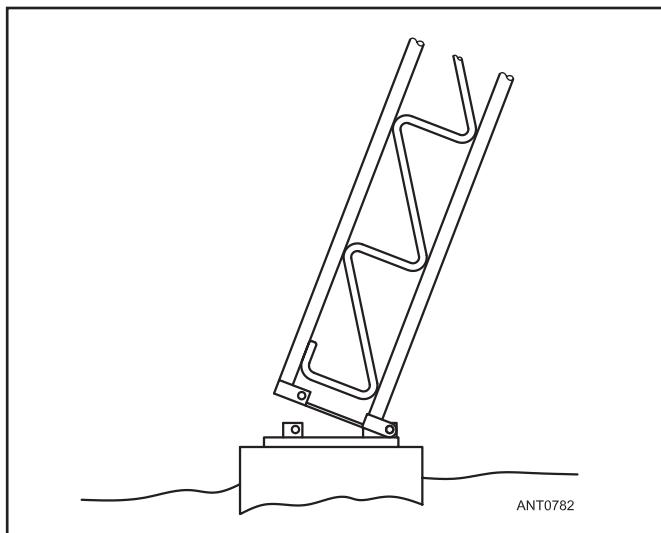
Fold-over or tilting base. There are several different kinds of hinged sections permitting different types of installation. Great care should be exercised when raising or lowering a tilting tower.
